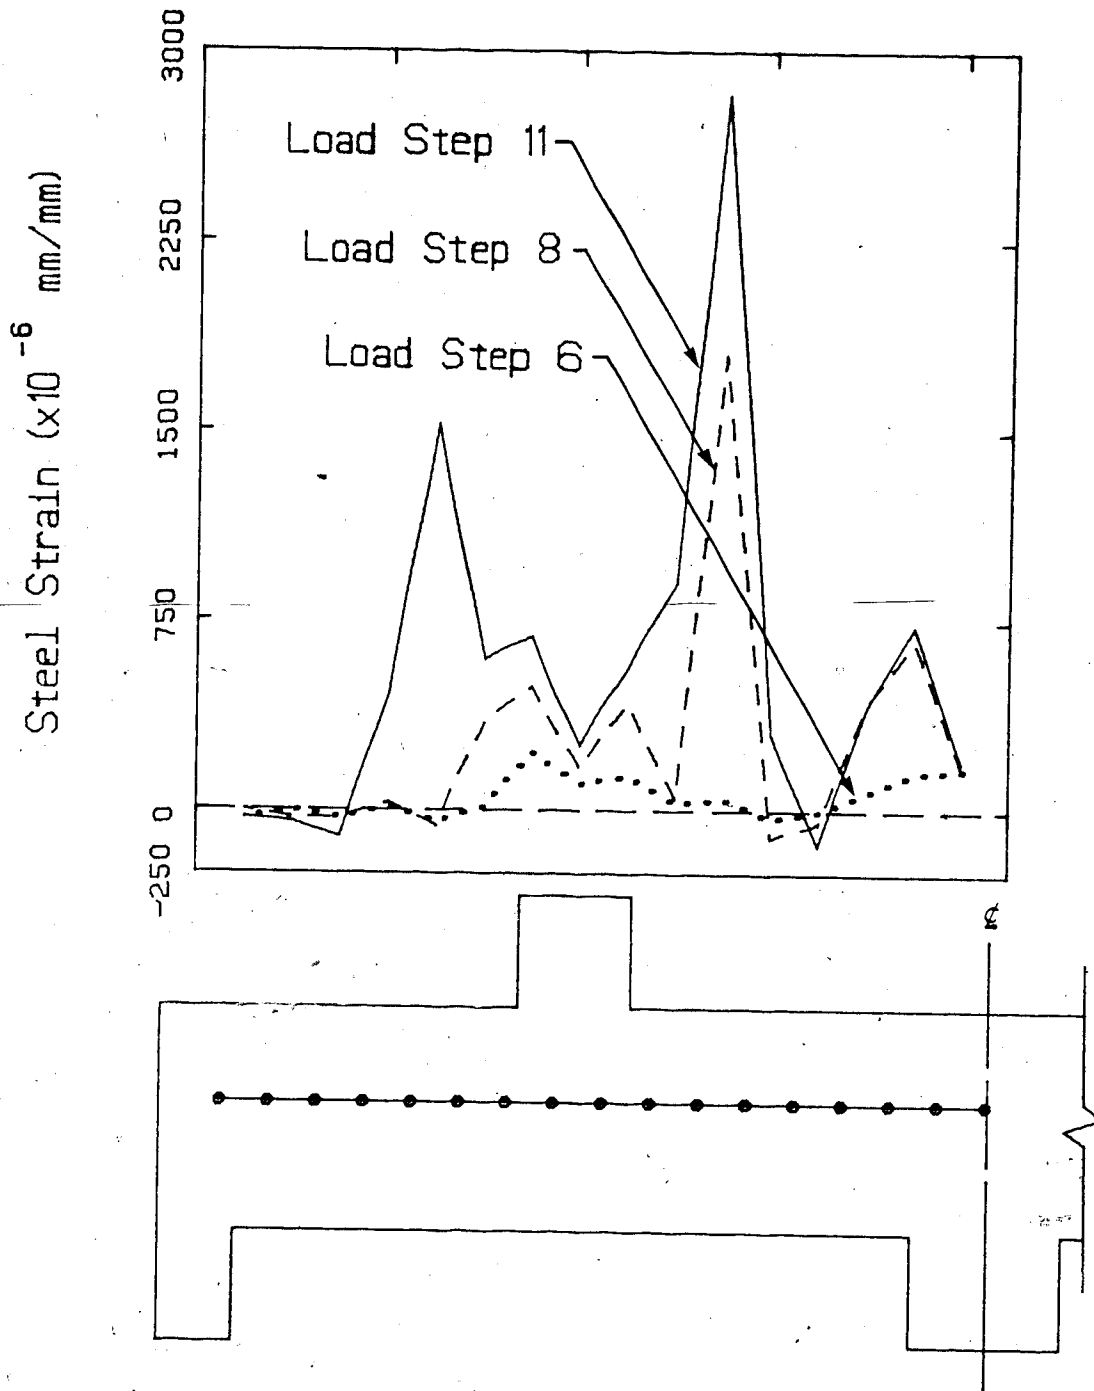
Typical Steel Strain Distribution in a Horizontal Stirrup
